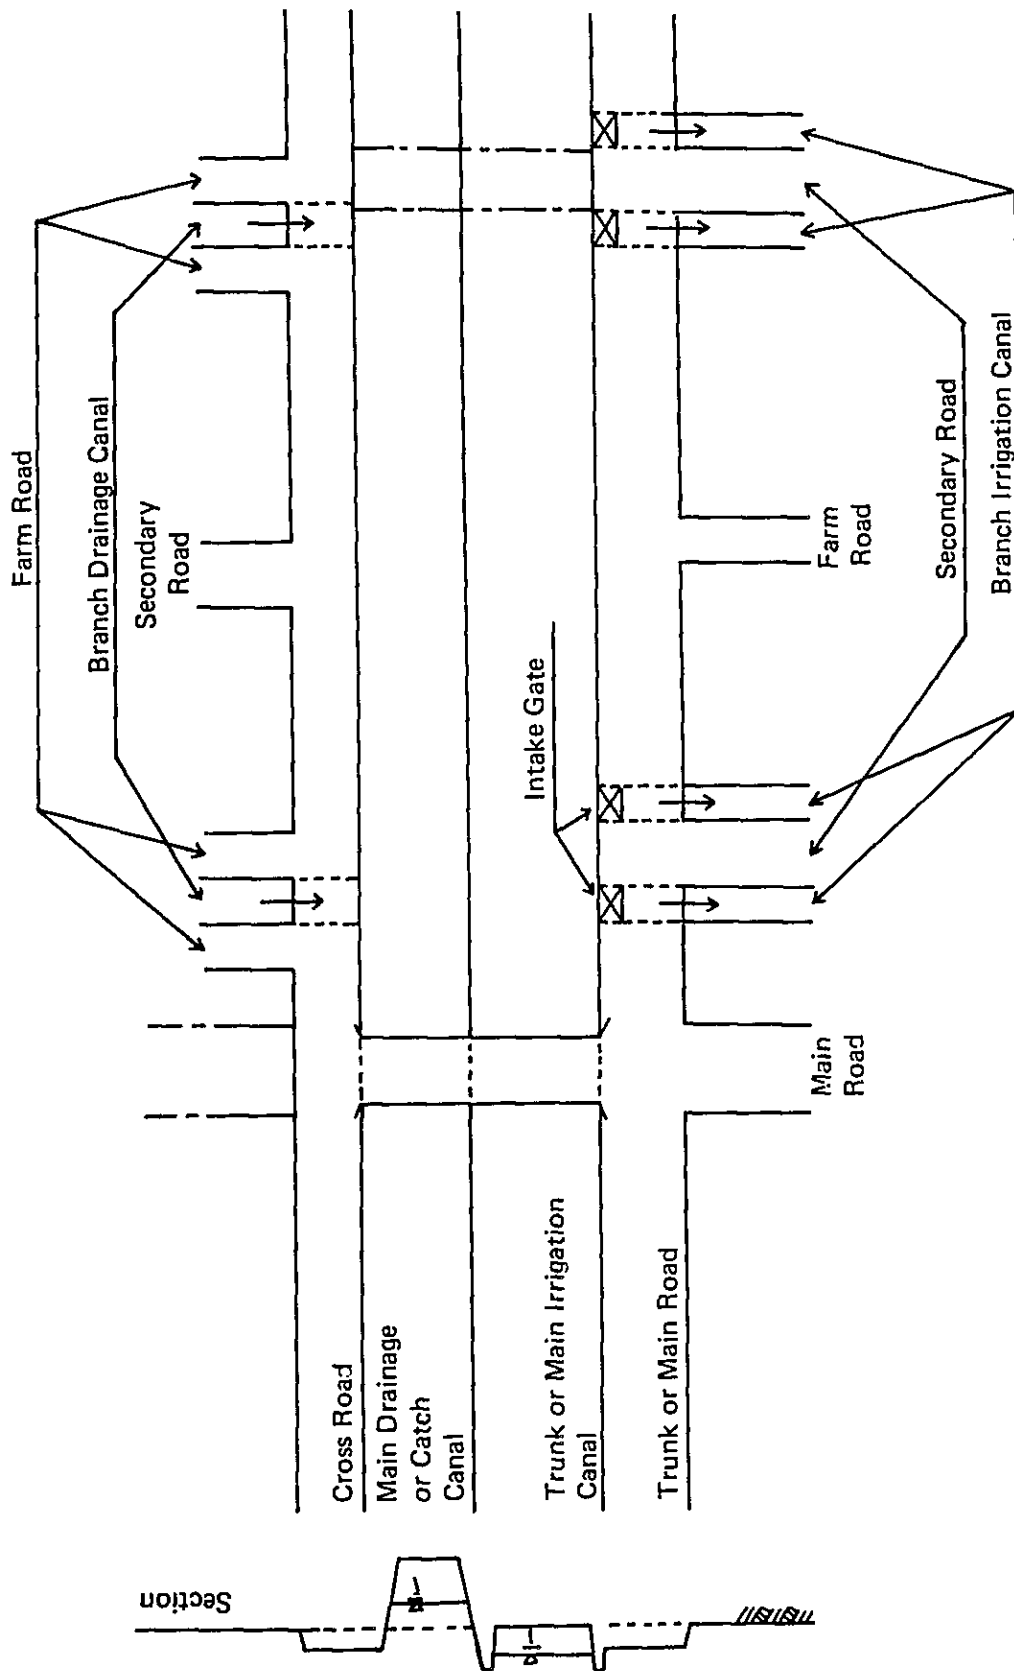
Layout of Main and Connecting On-farm Structure
